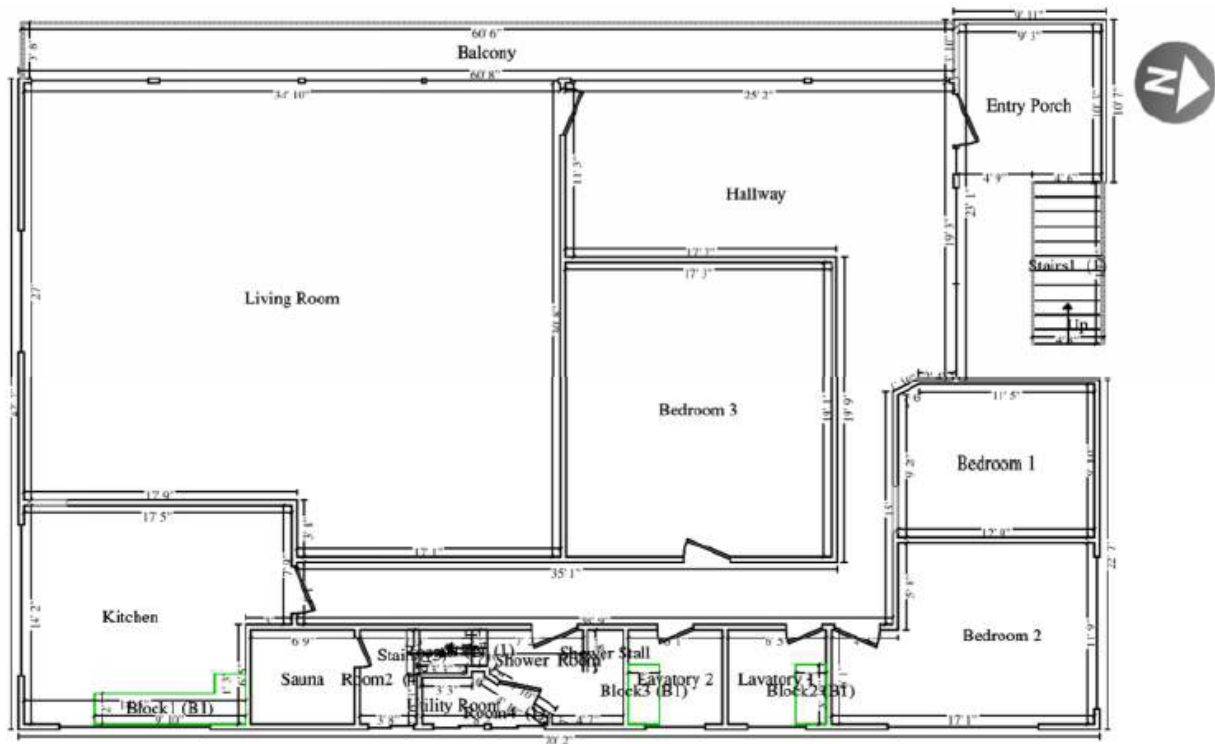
Second floor sketch (provided by Alliance Loss Consultants, LLC)
